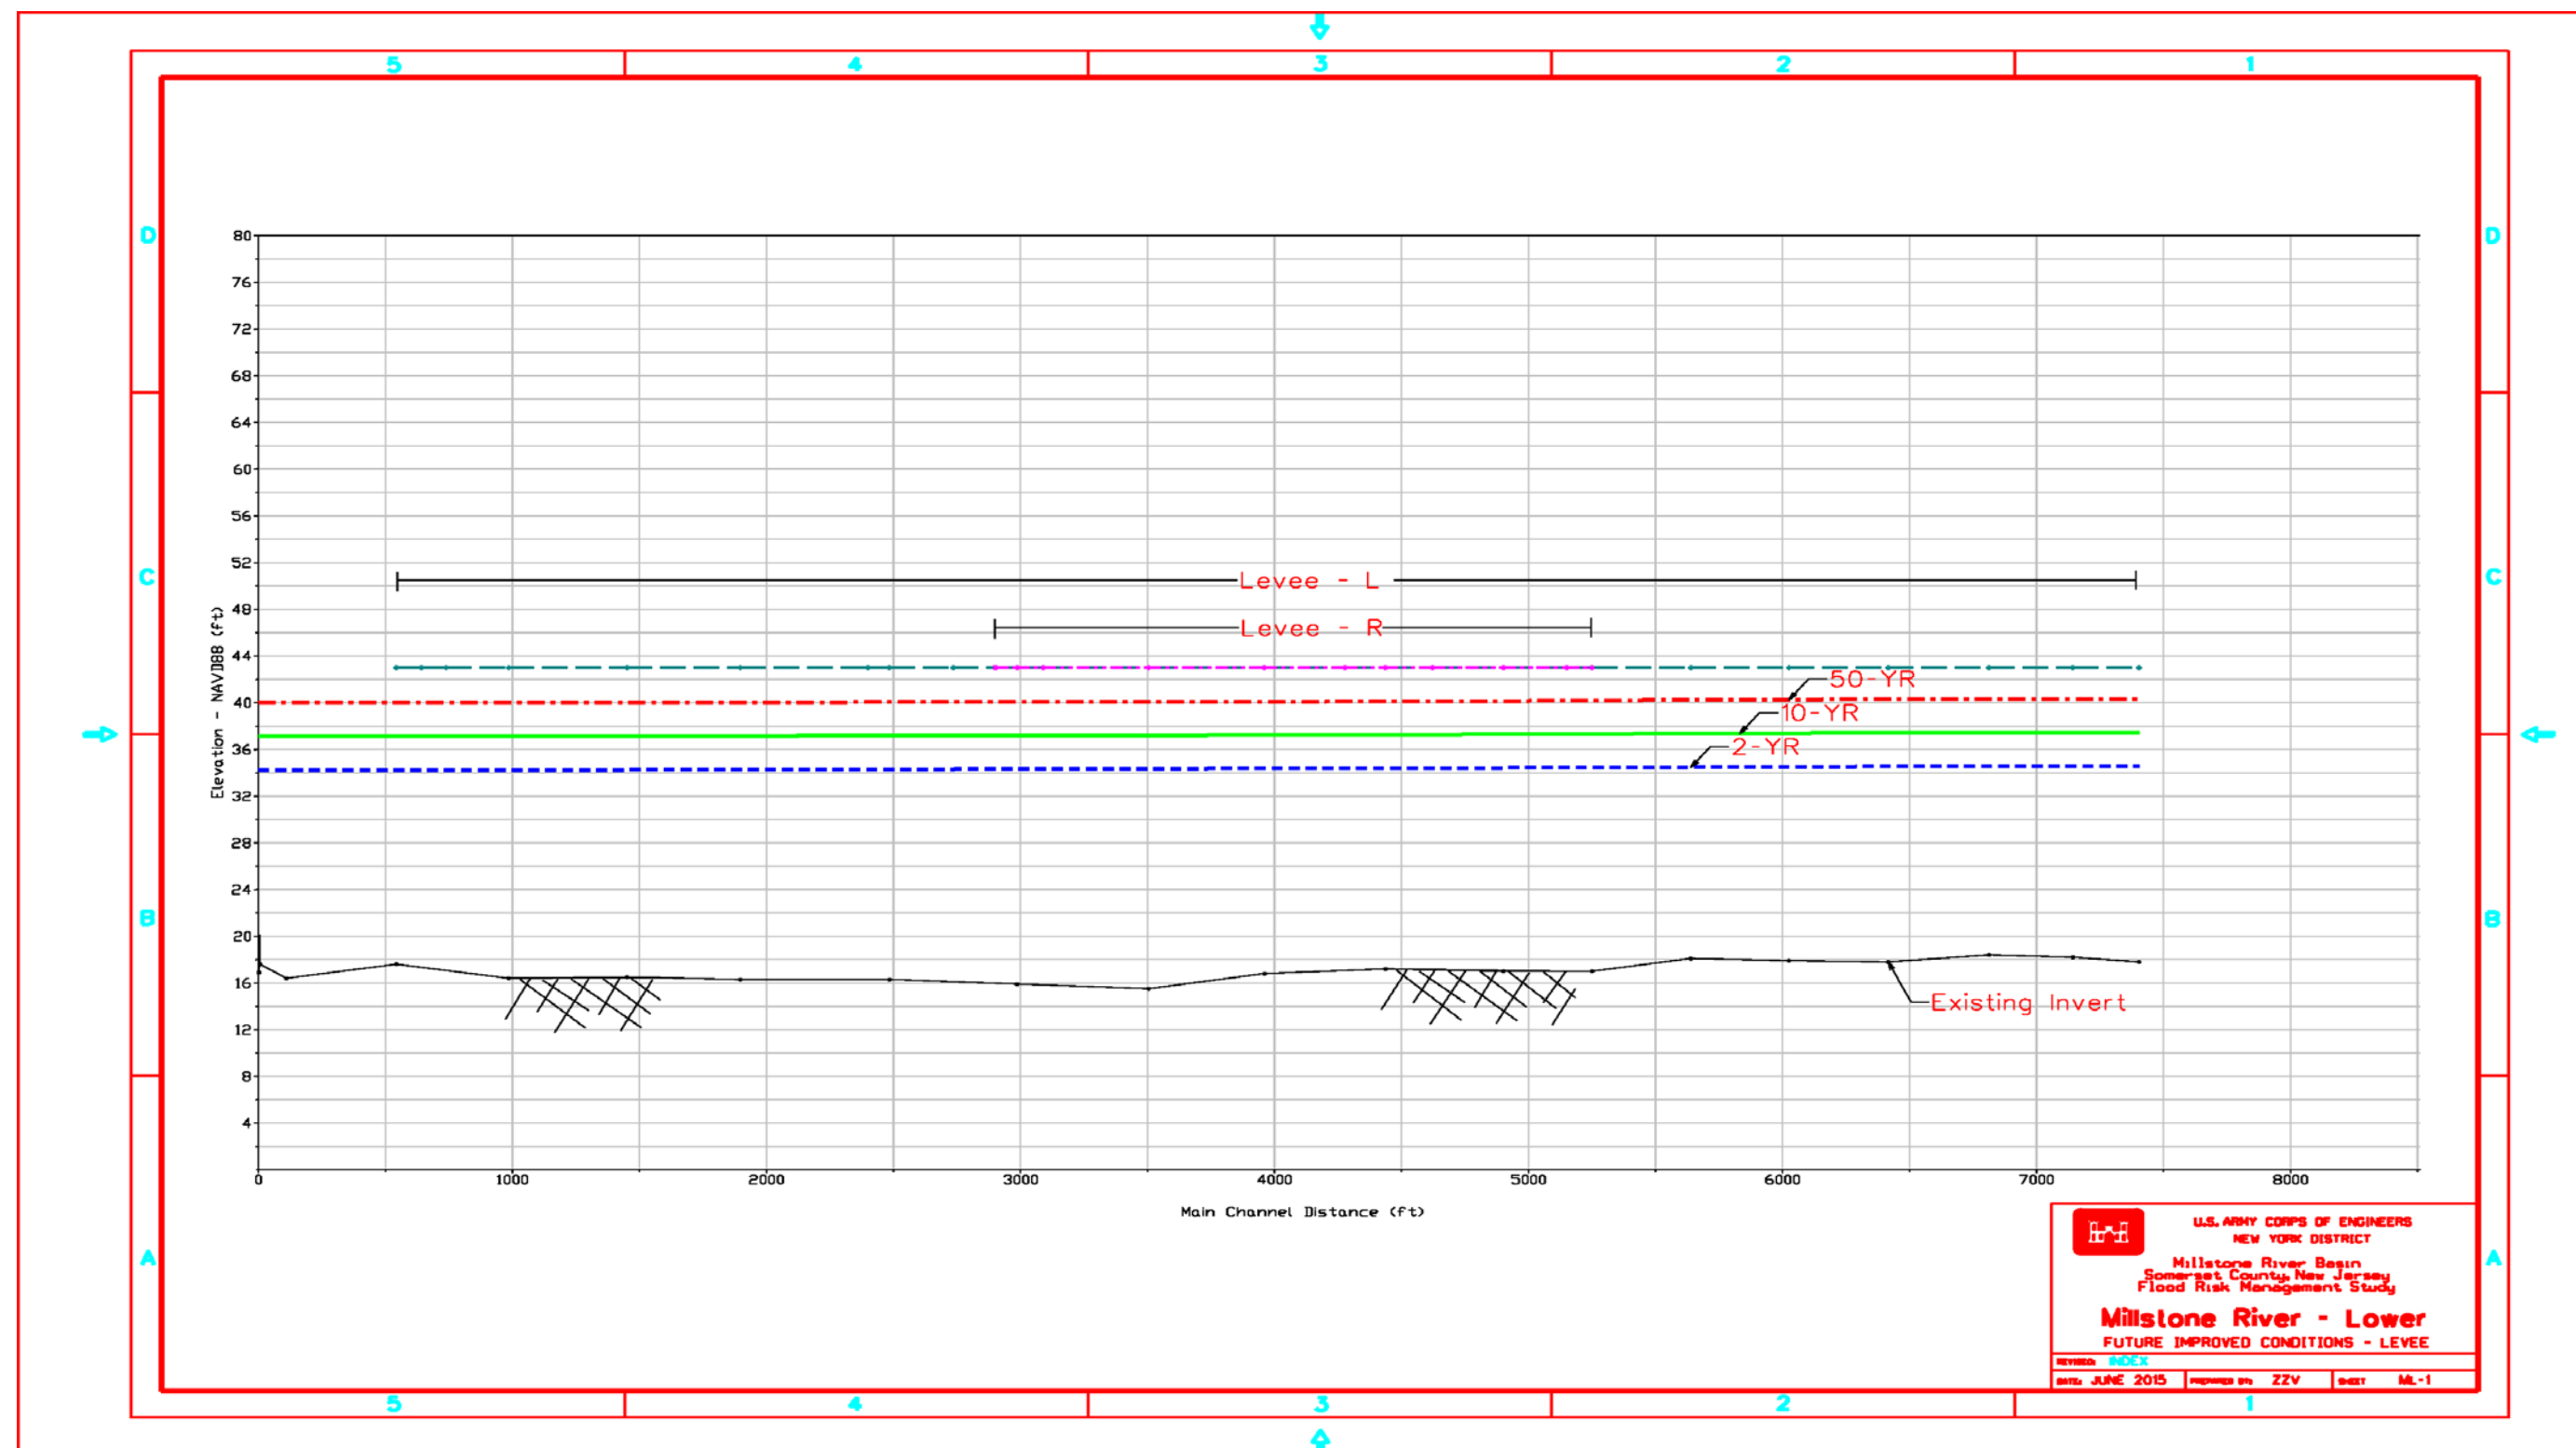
MAXIMUM WATER SURFACE PROFILE FOR LEVEE & FLOODWALL PLAN - FUTURE IMPROVED CONDITIONS (MILLSTONE RIVER LOWER)
